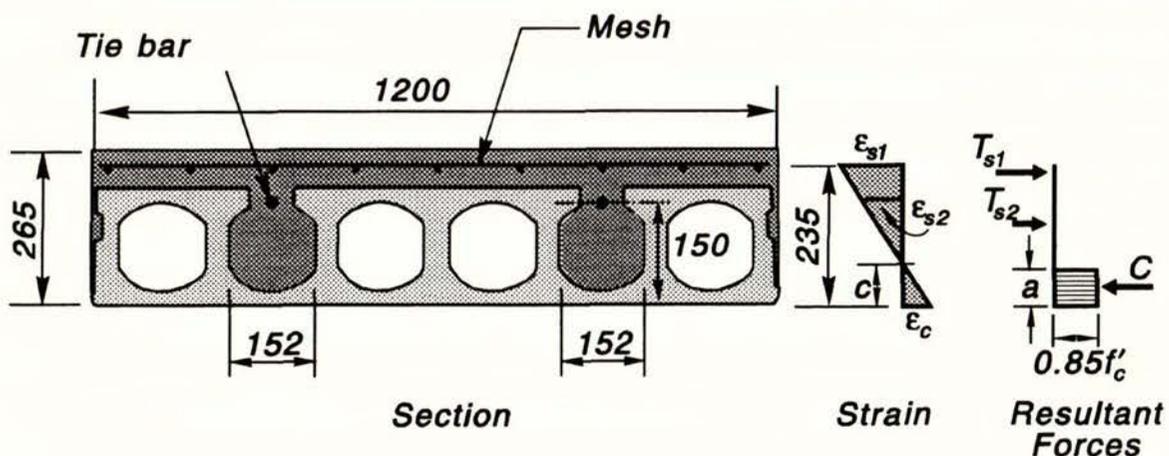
Section at Flexural Strength on Test A of Connection Type 1
